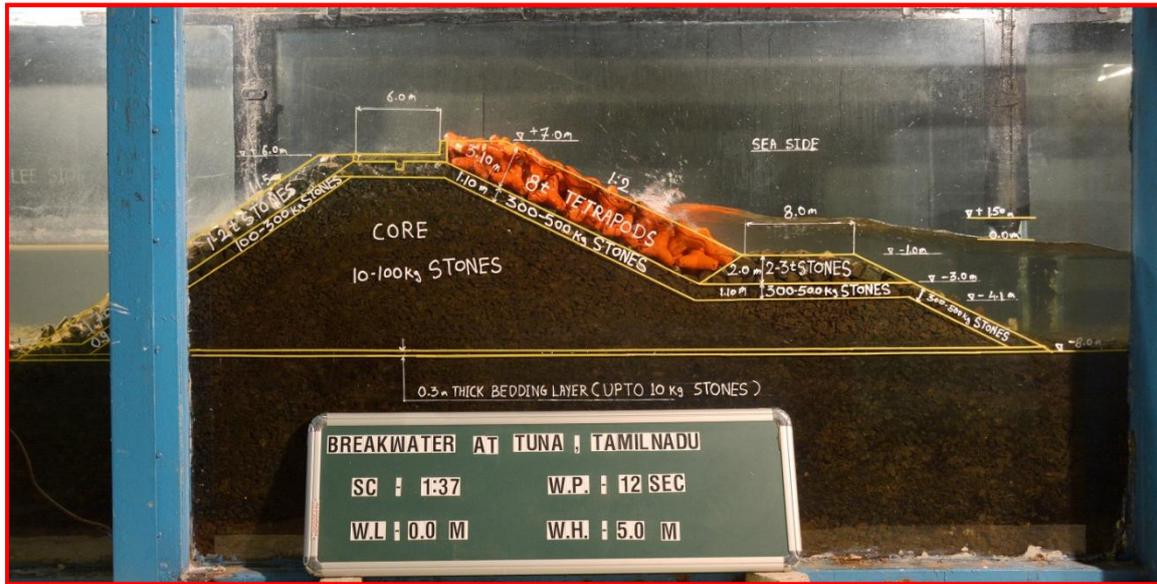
Wave action on armour layer of breakwater consisting of 8 t Tetrapods at -8.0 m bed level with 0.0 m water level and 5.0 m wave height
